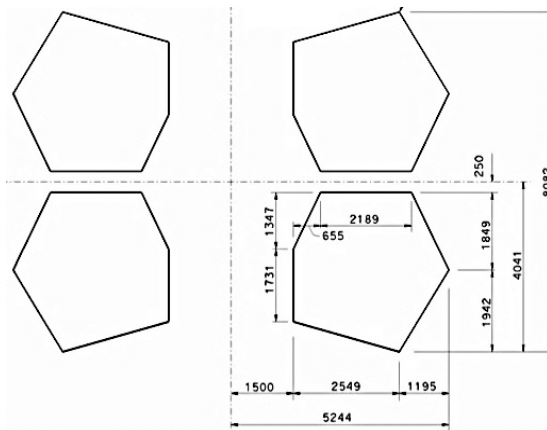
Cross section of the 4 separate columns for the west piers (Ref.: *Caltrans*).
